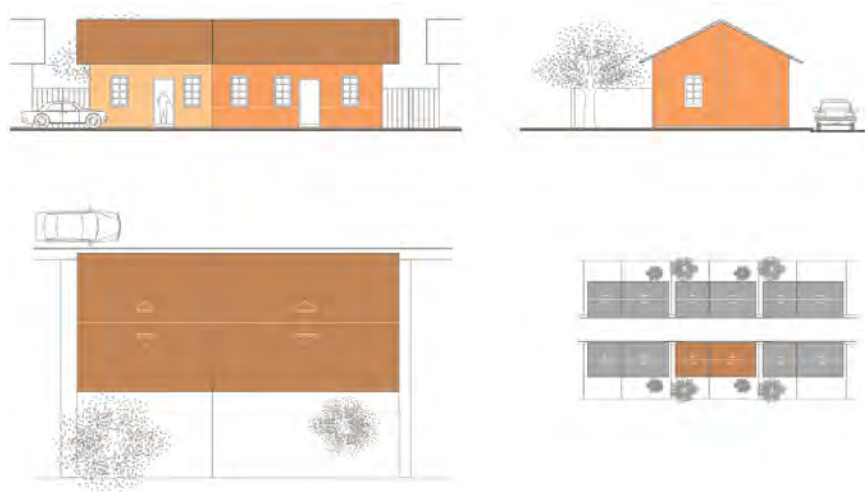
Townhouses type. Schema of façades, building implantation and situation. (Source: Schemas produced by the authors, no scale).
